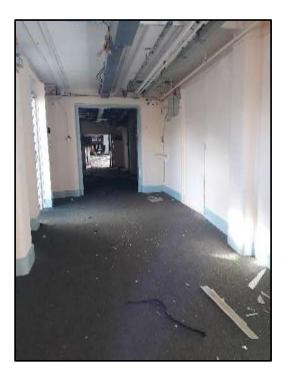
E Block, view west along central corridor range from outside spurs13 and 14
